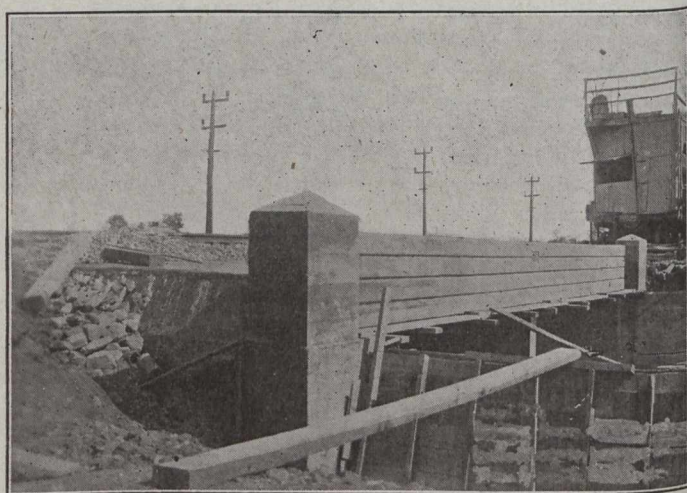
Southwest Corner of Bridge, Showing Waterproofing.
